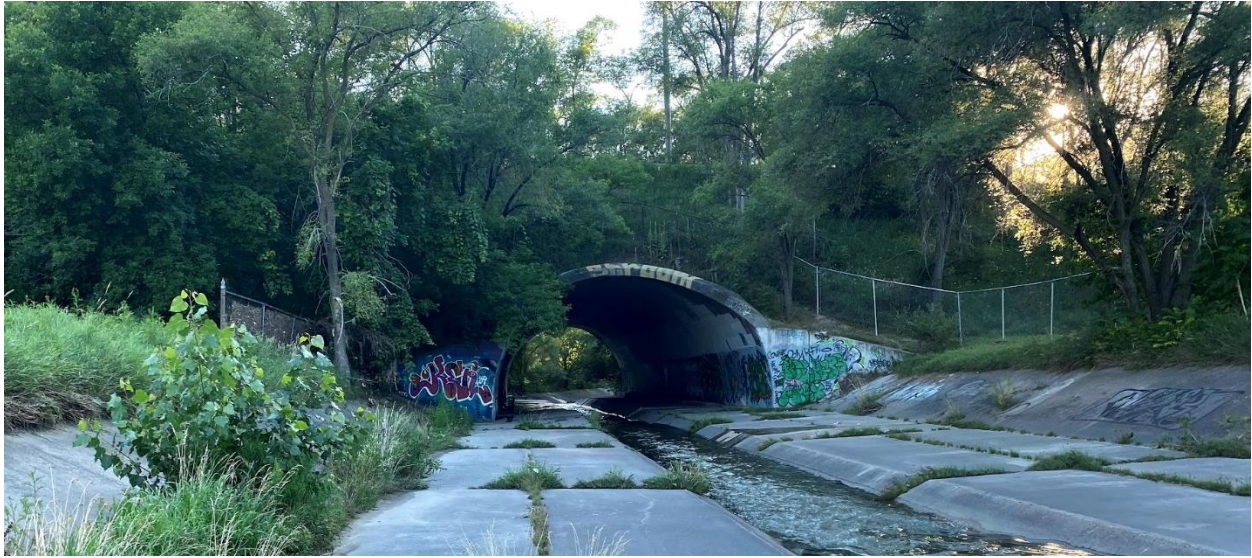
The Jane Street Culvert (Photo Credit: Alana Wittman, July 2020)
